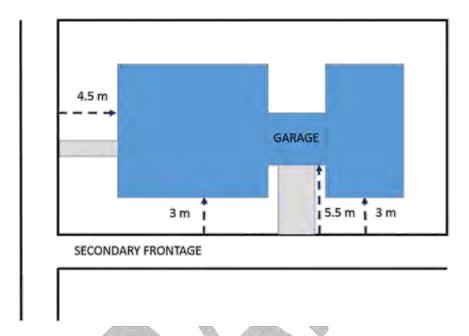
Corner allotment with the main entry to the primary road and the garage to the secondary road, with a setback minimum of  $5.5\ m$
